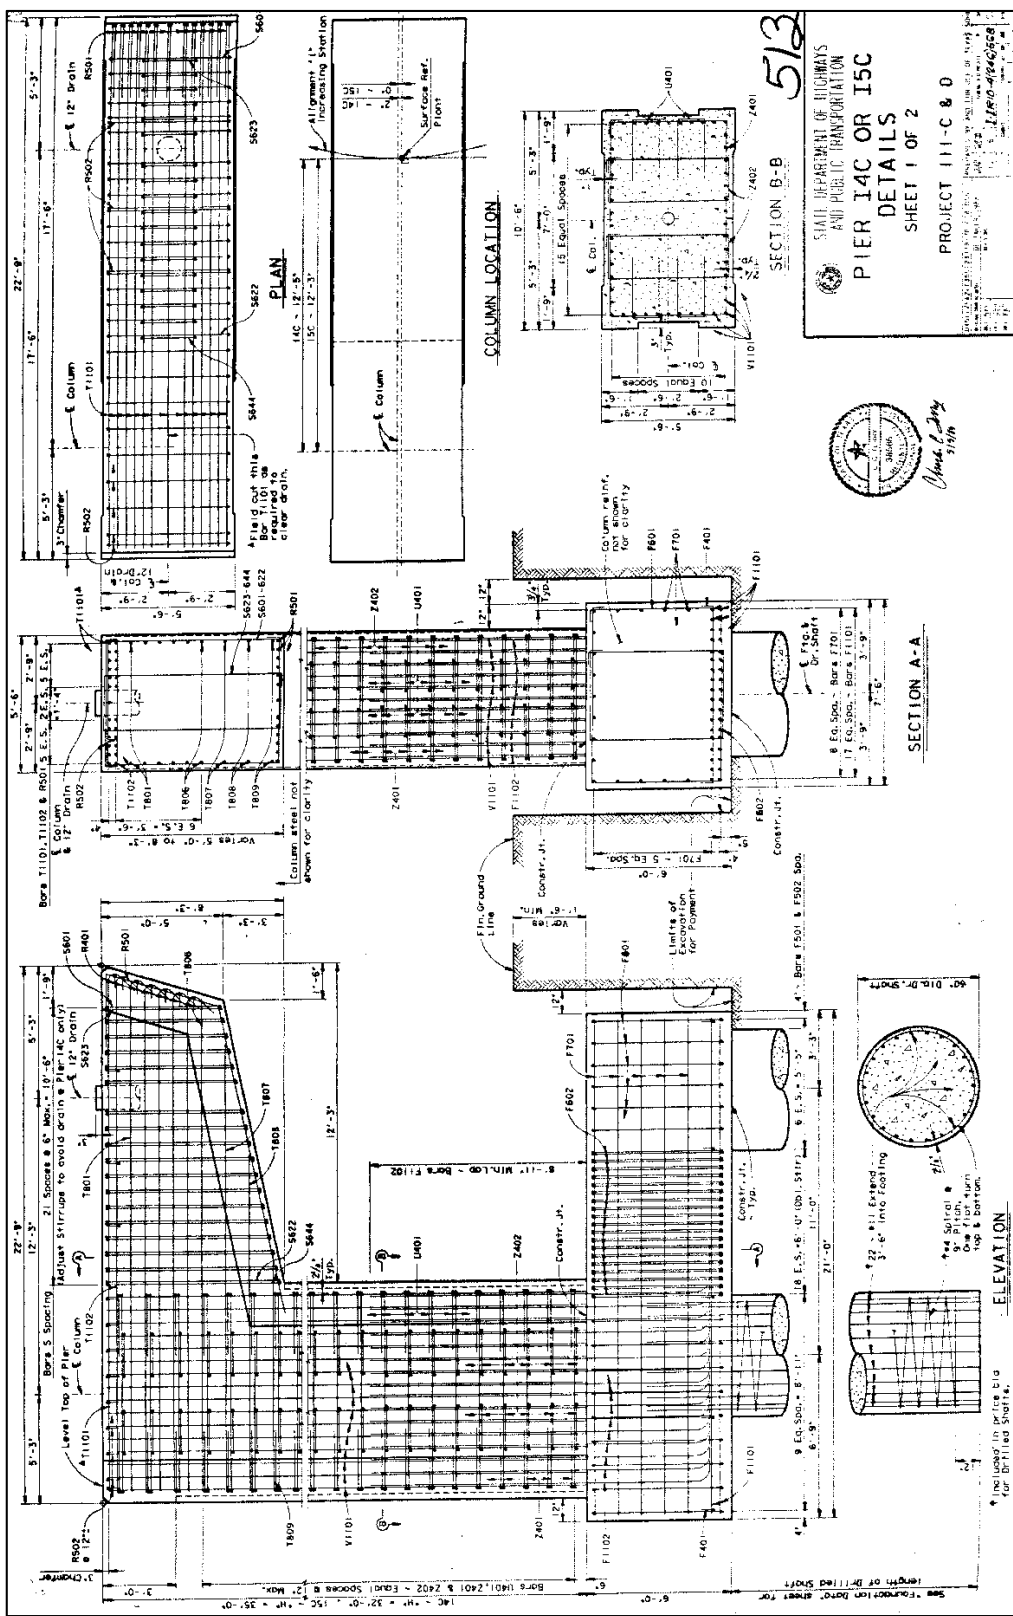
Layout and Reinforcement Detail of Pier I5C (Adopted from Mander et al., 2012).
